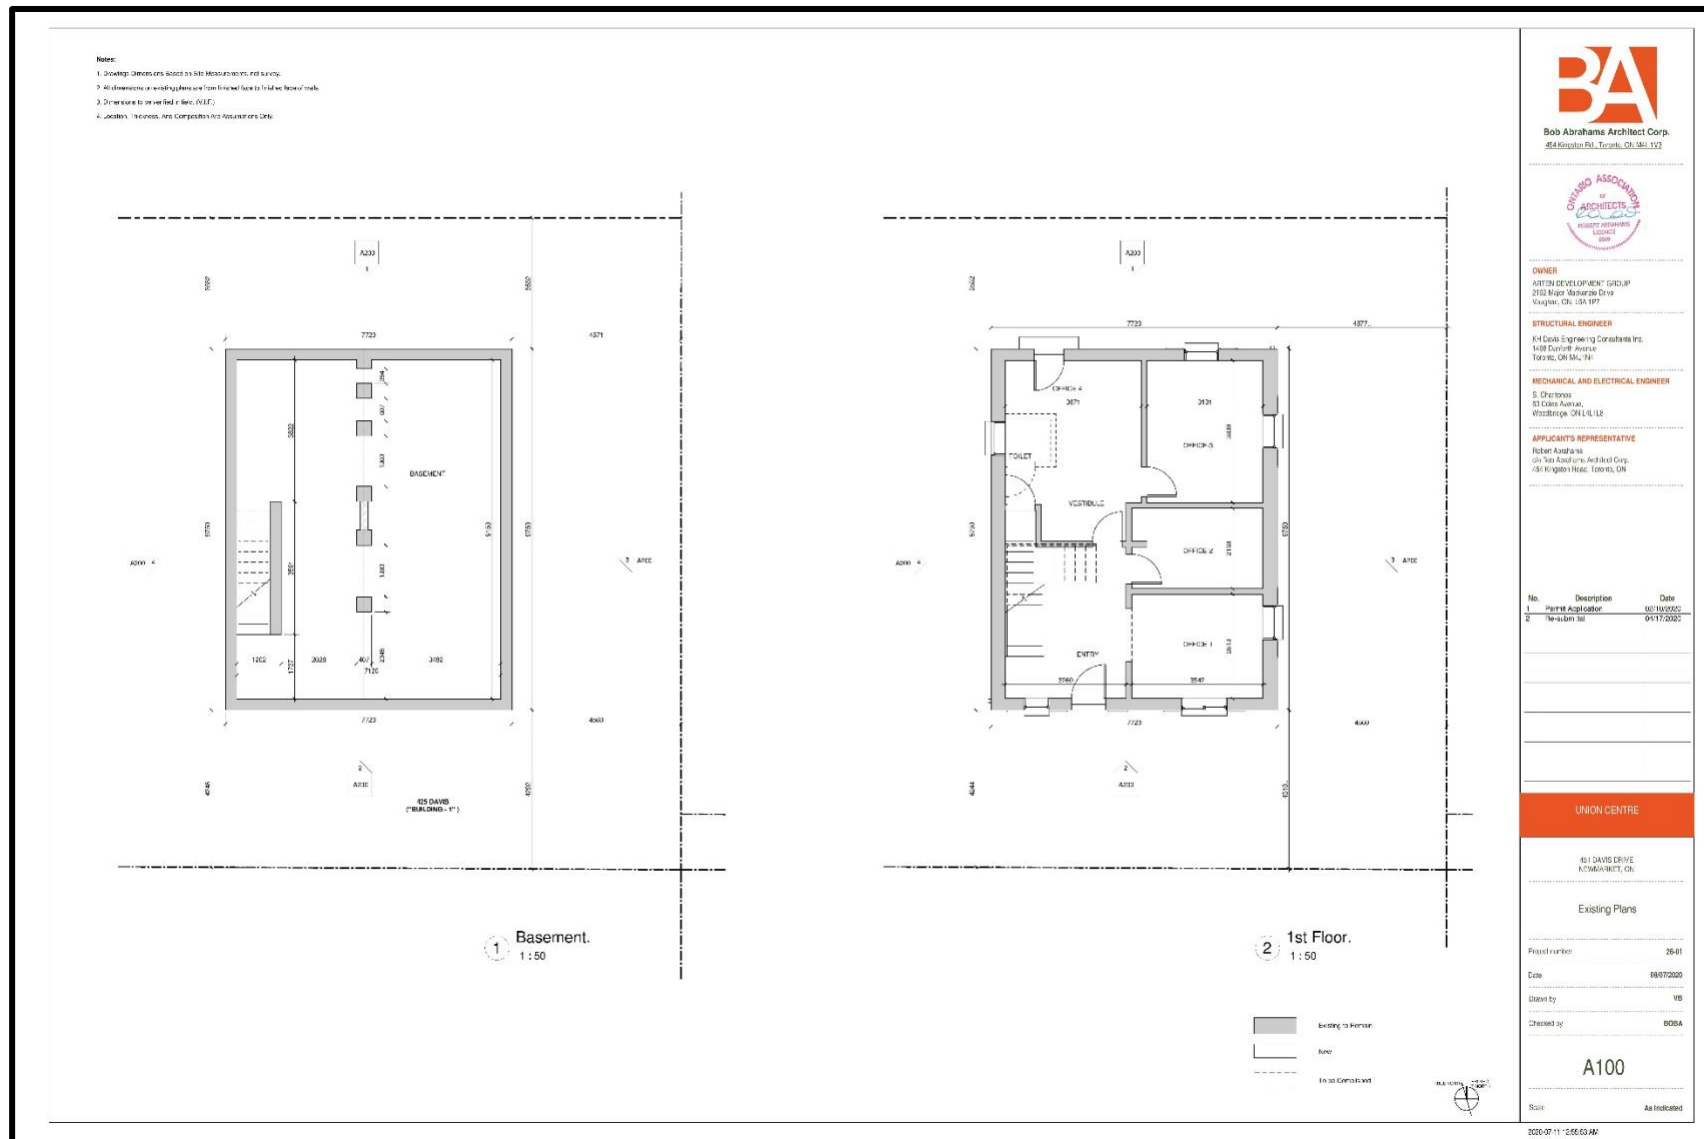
Existing Basement and 1st Floor Layout for 431 Davis Drive
